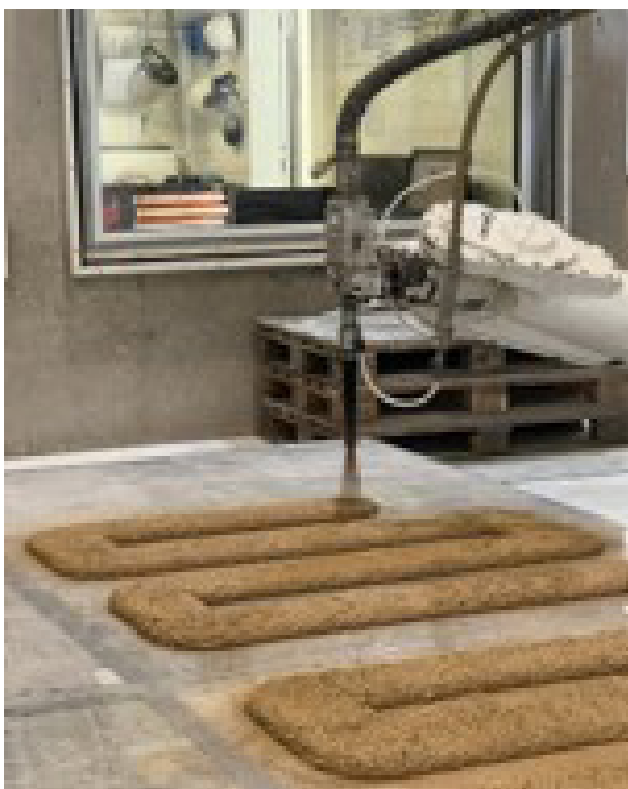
Additive manufacturing based on spraying: SEAM, ITE, TU Braunschweig.
